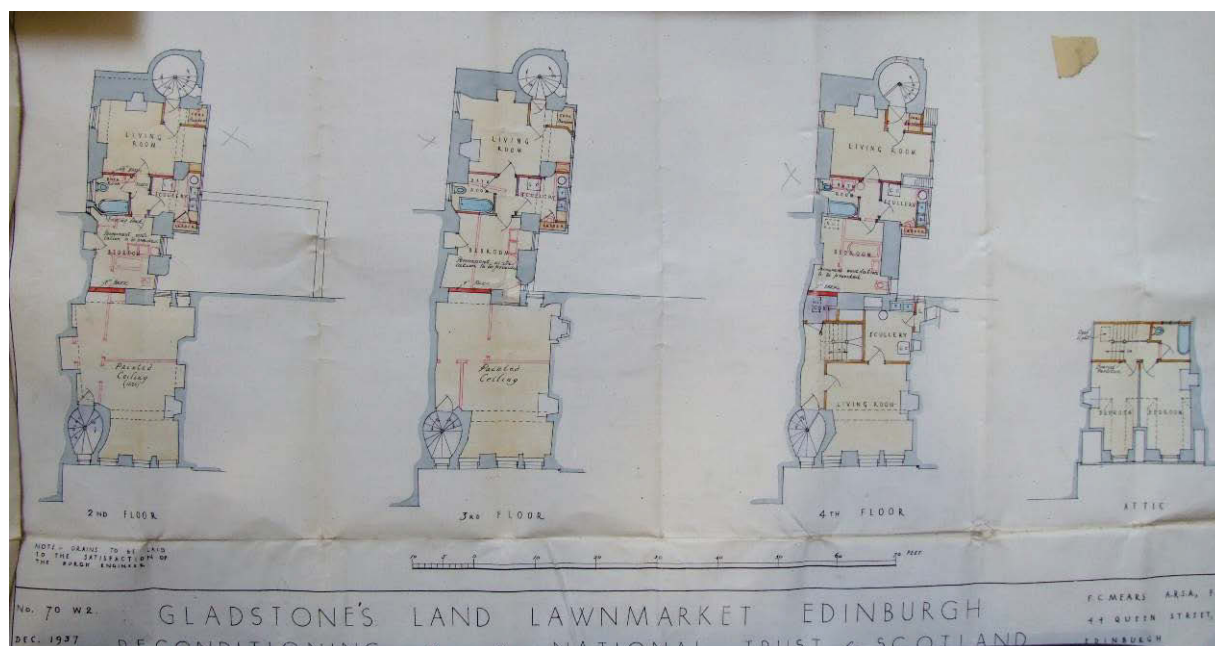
Plans showing warranted deviation of December 1937 from previously warranted scheme. Alterations to retain painted ceiling rooms on second and third floors. Filed in application to Dean of Guild dated 3rd July 1936. City of Edinburgh plan store
